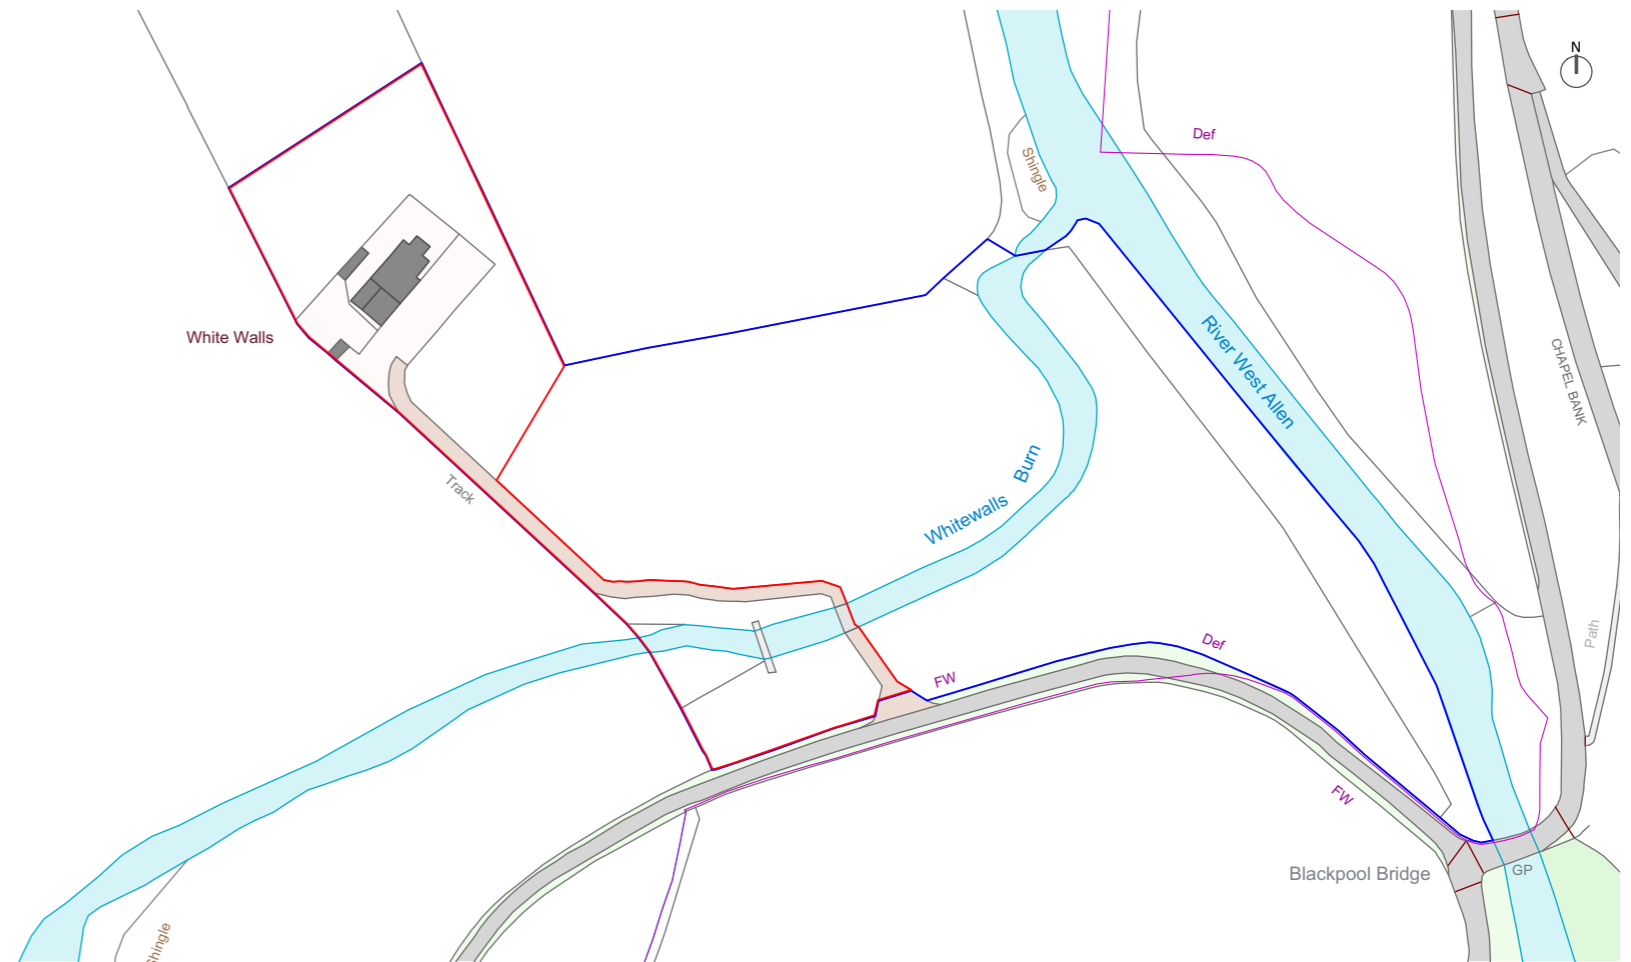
Existing Site Location Plan NOT TO SCALE
